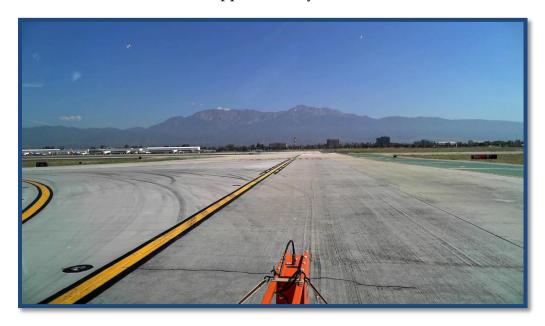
Taxiway W Representative Pavement Condition (Sta. 1+25)
